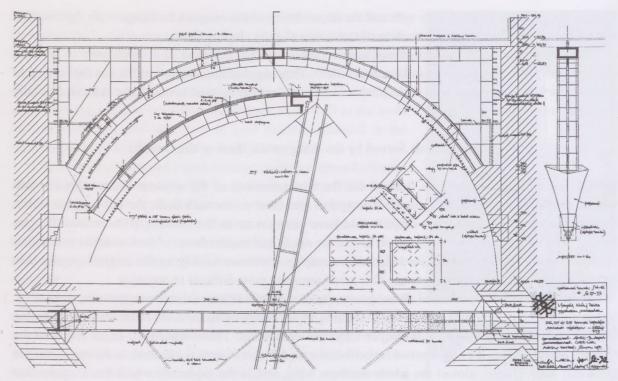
The construction drawing of the gypsum concrete vault in the cross vaulted halls in the upper floor suite
